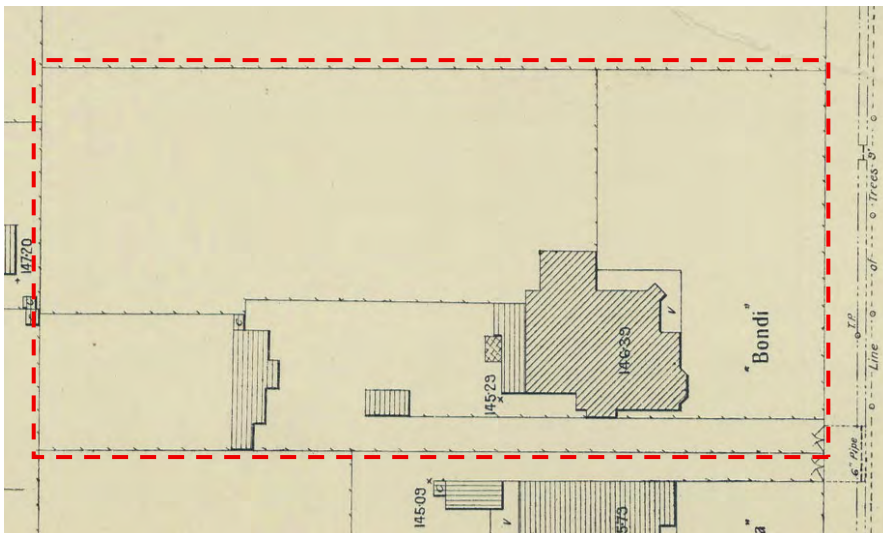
MMBW Detail Plan No 2850 showing the footprint of the house at 107 Murrumbeena Road, 1919. The diagonal hatching indicates a brick building, the vertical hatching indicates a timber building (Source: SLV)
